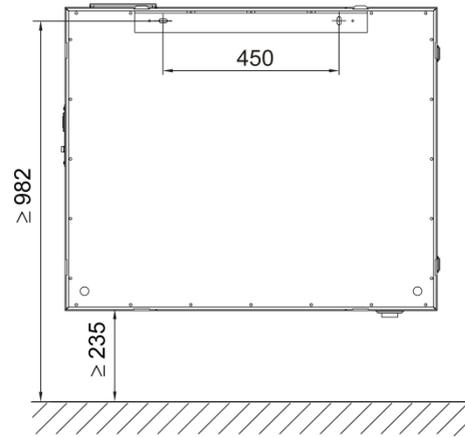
Horizontal wall mounting (HORIZONTAL - RIGHT version)
